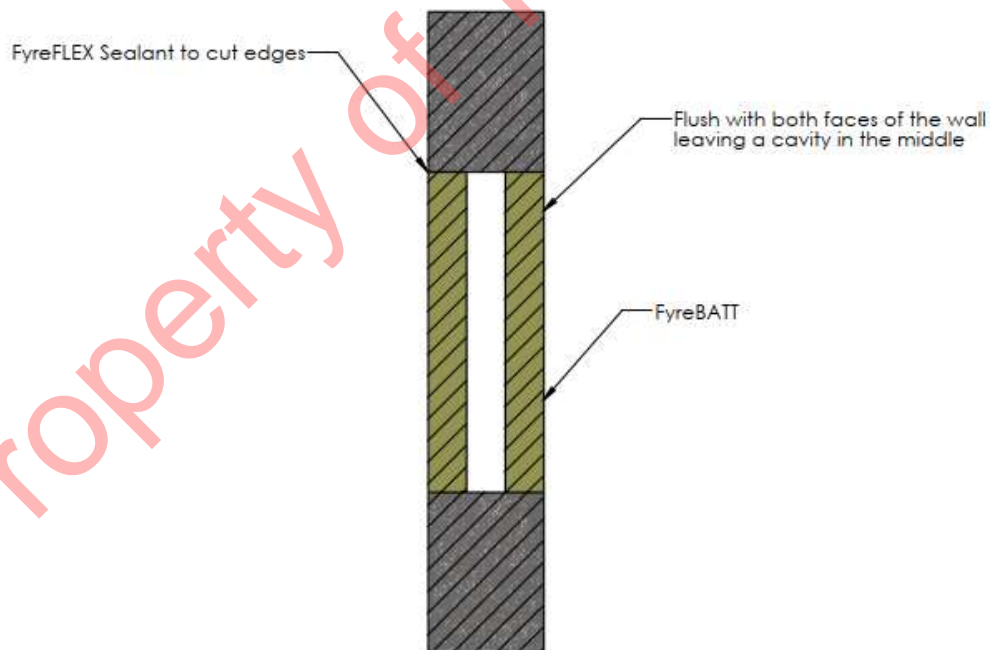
Blank seal protected with two layers of FyreBATT in concrete / masonry wall
